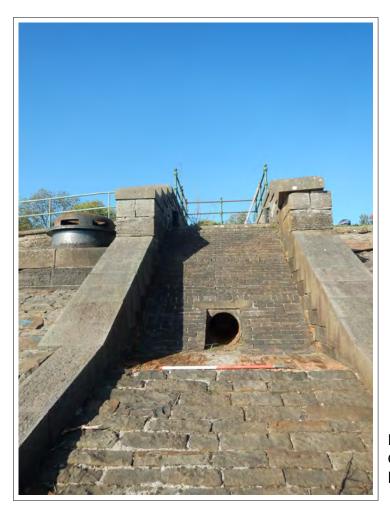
South-east elevation of the Inlet Gauge Chamber showing the outlet pipe, looking north-west. Scale 1m.
